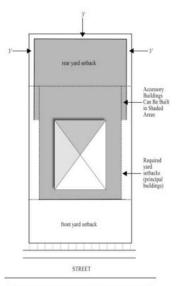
Figure II: Accessory Building Placement Accessory buildings may be located in shaded areas.
